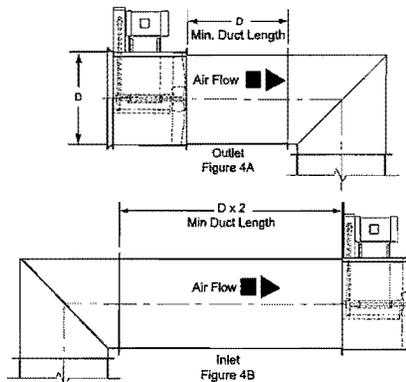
Duct elbows (Inlet and Outlet) Recommendations
